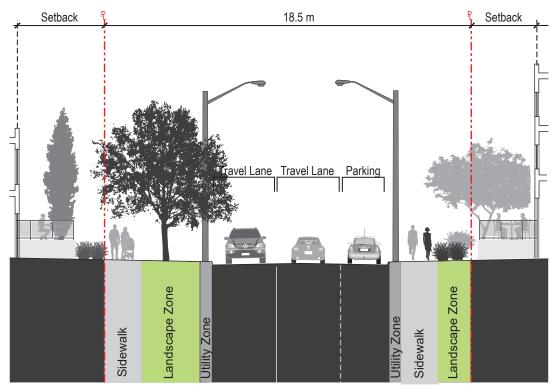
shows the conceptual cross-section for a typical 18.5-metre connection. A typical local connection is recommended to include:
